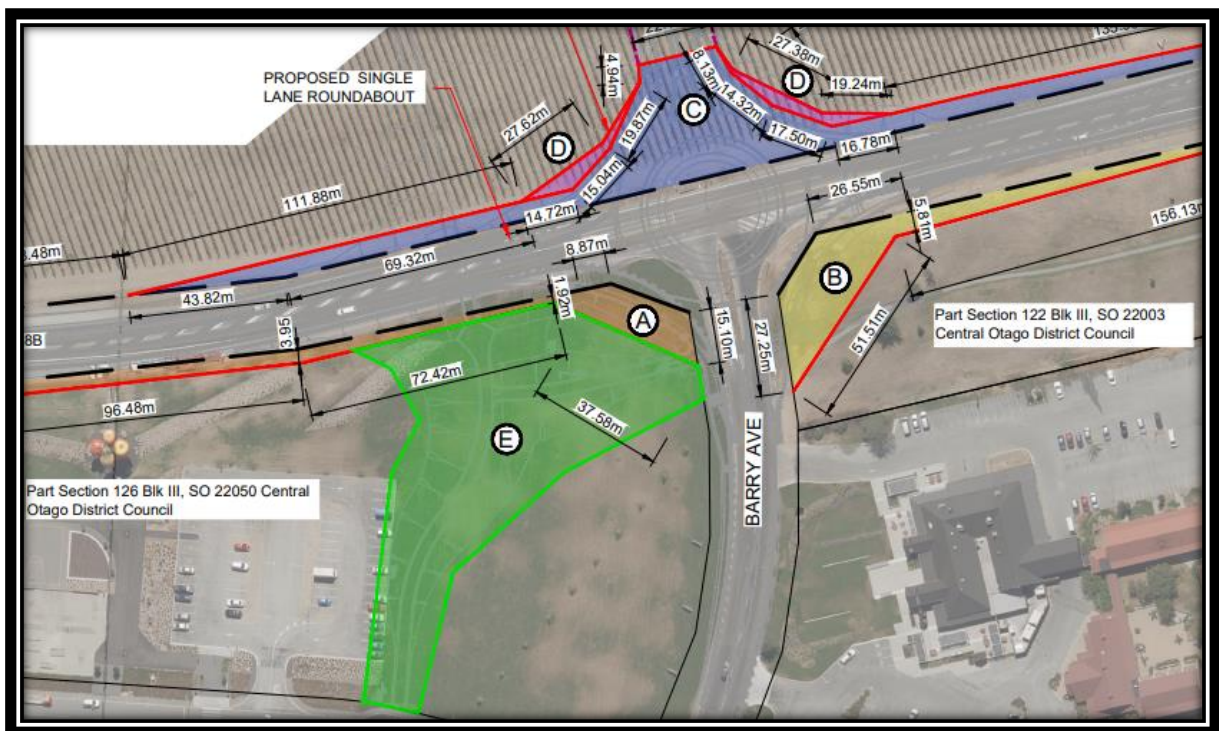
Revised (Preliminary) Plan of the 'Wooing Tree' Roundabout.
